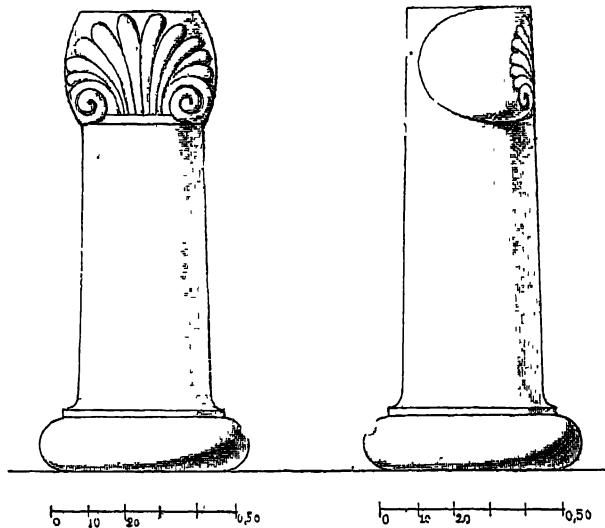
Elevation and profile of pilaster in Broken Tomb.
